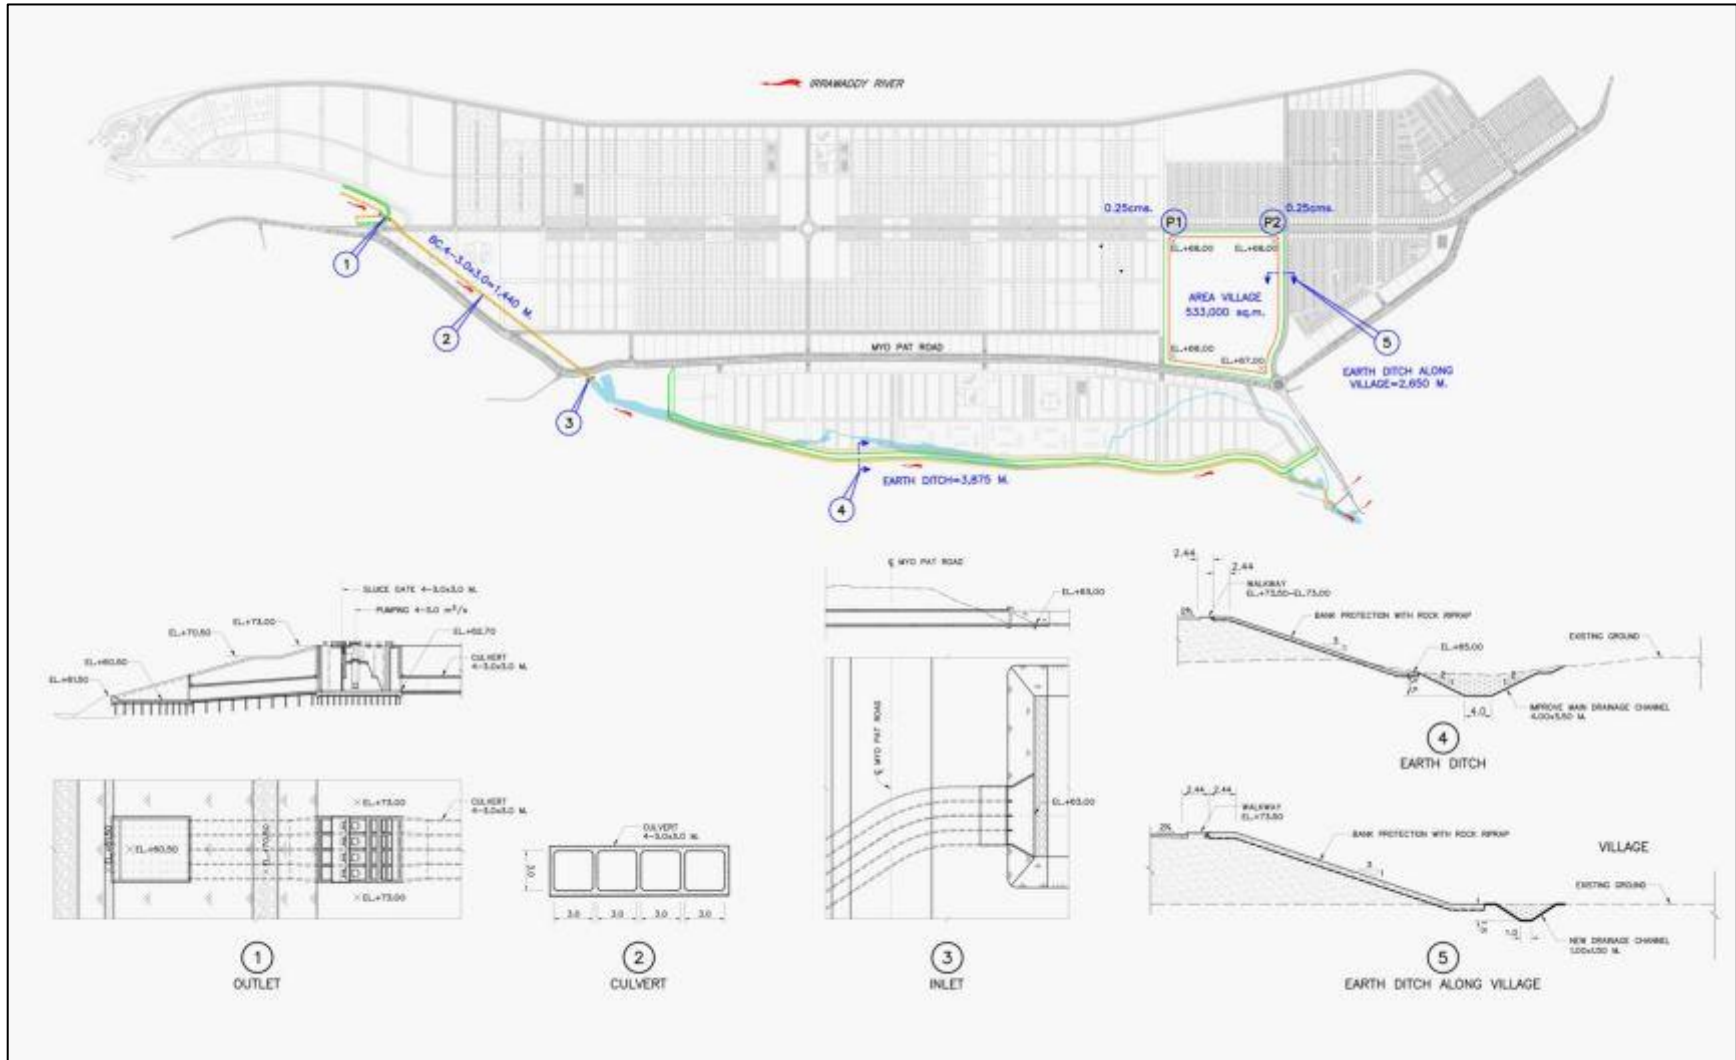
Design Drainage Systems for Outside after Project Development Alternative 1
